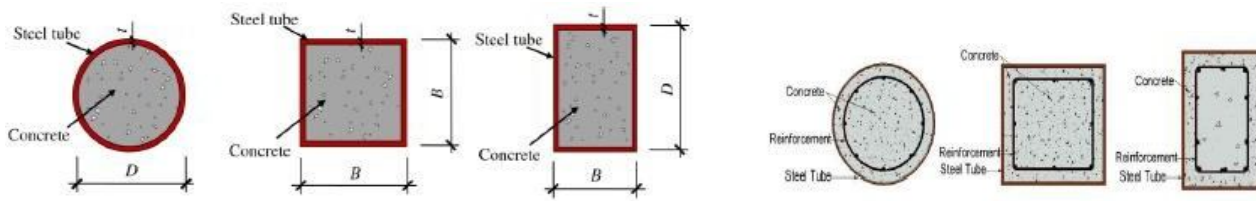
Typical Cross-Sections of Simple Composite & RCC Columns
